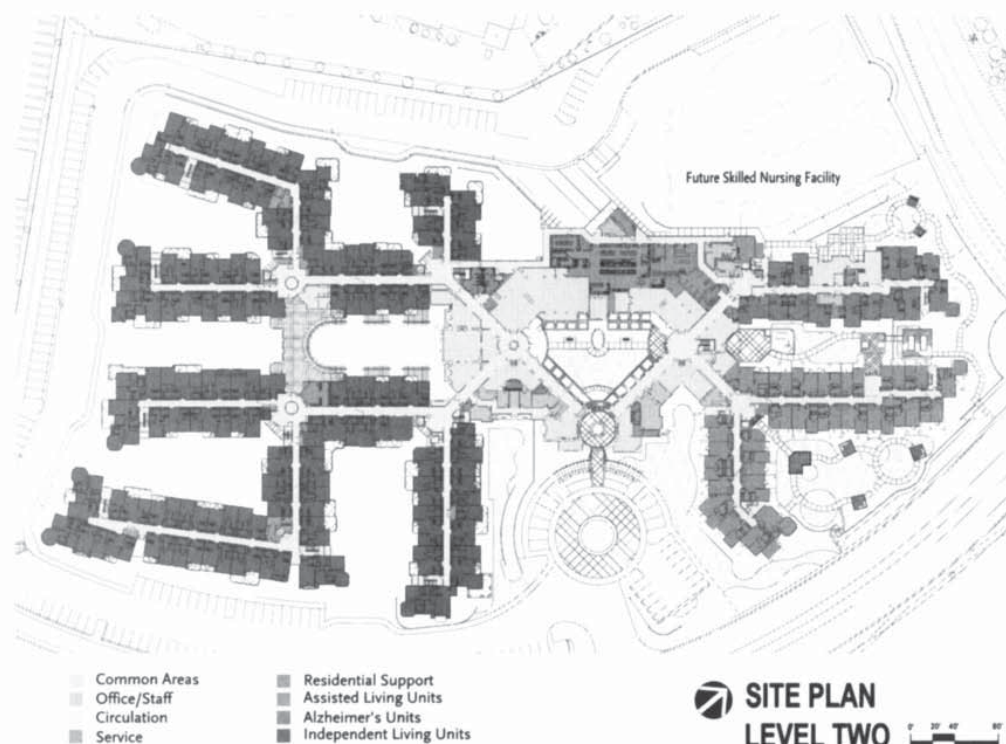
Site plan, level two *Courtesy of Mithun
